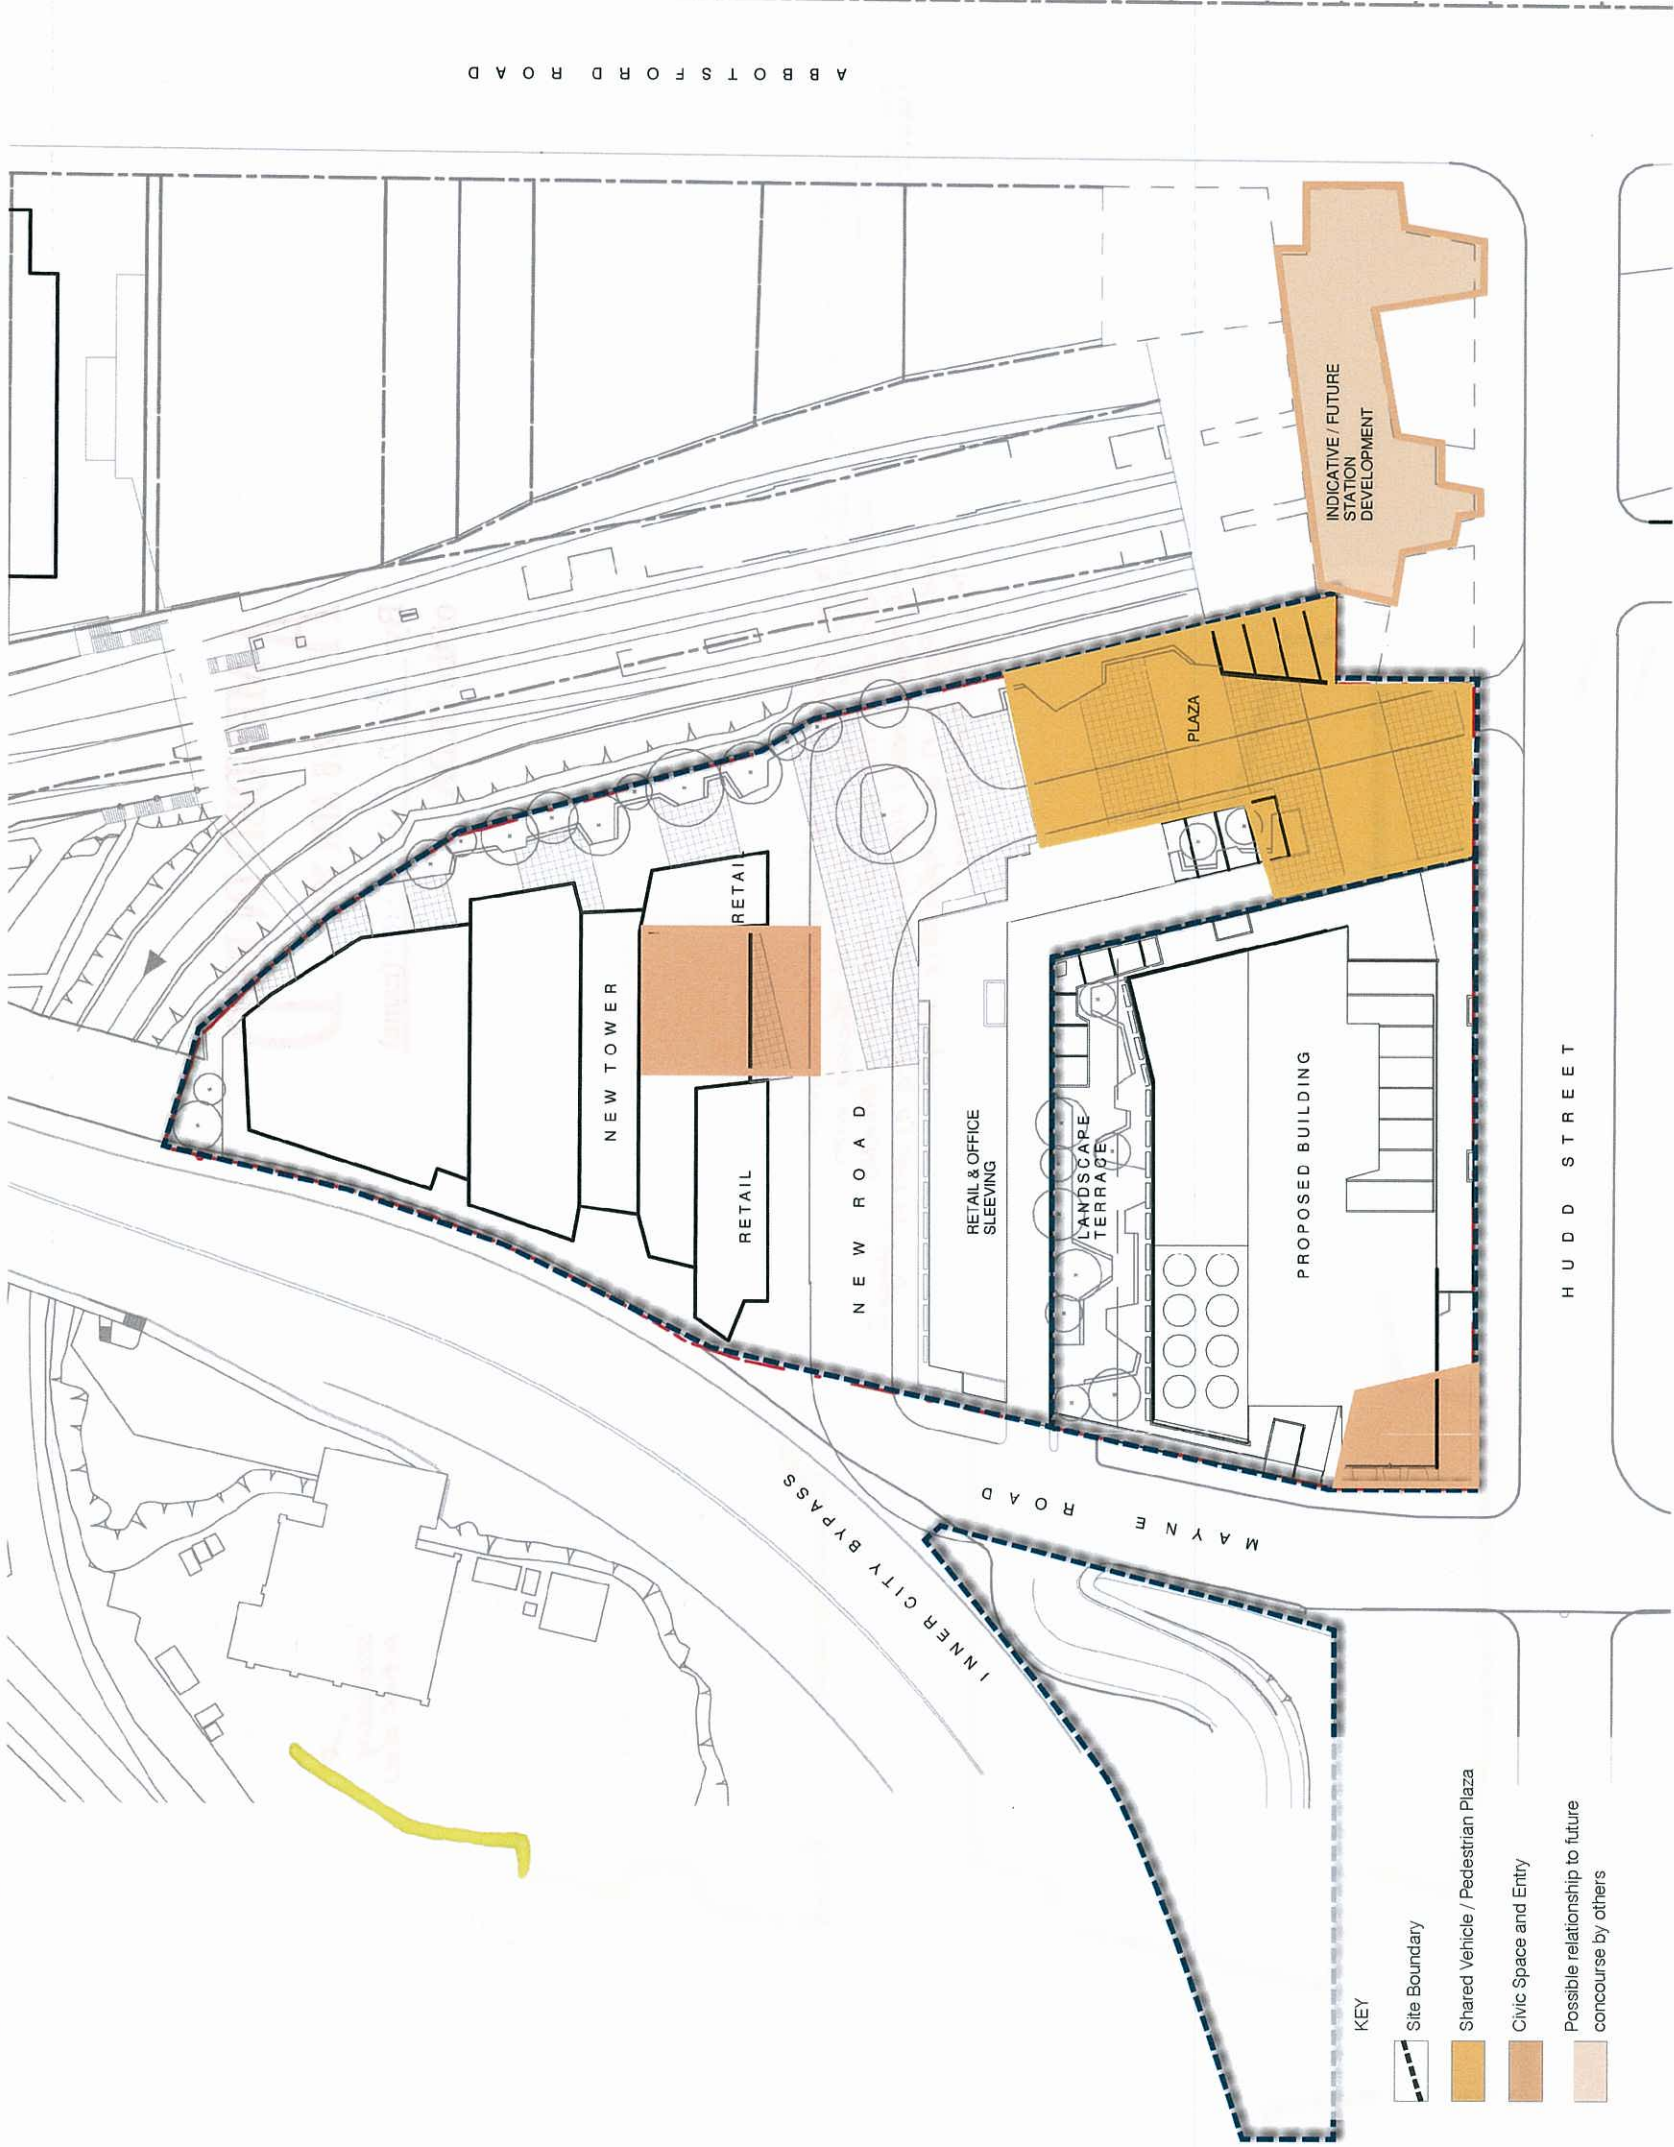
OPEN SPACE AND PUBLIC REALM PLAN
